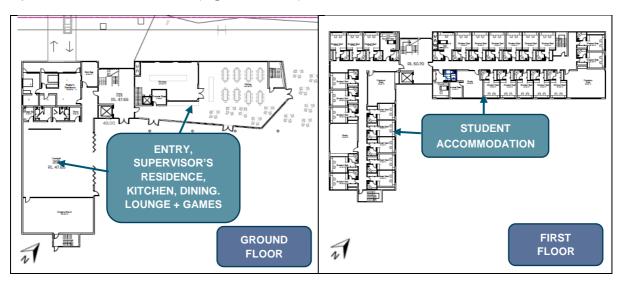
| Boarding accommodation - ground and first floor plan (Source: Applicant's RtS 2020)
